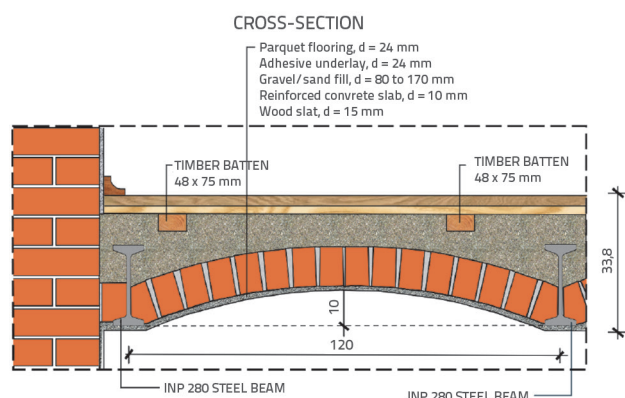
Cross-section of a floor structure with shallow masonry vaults and steel beams
